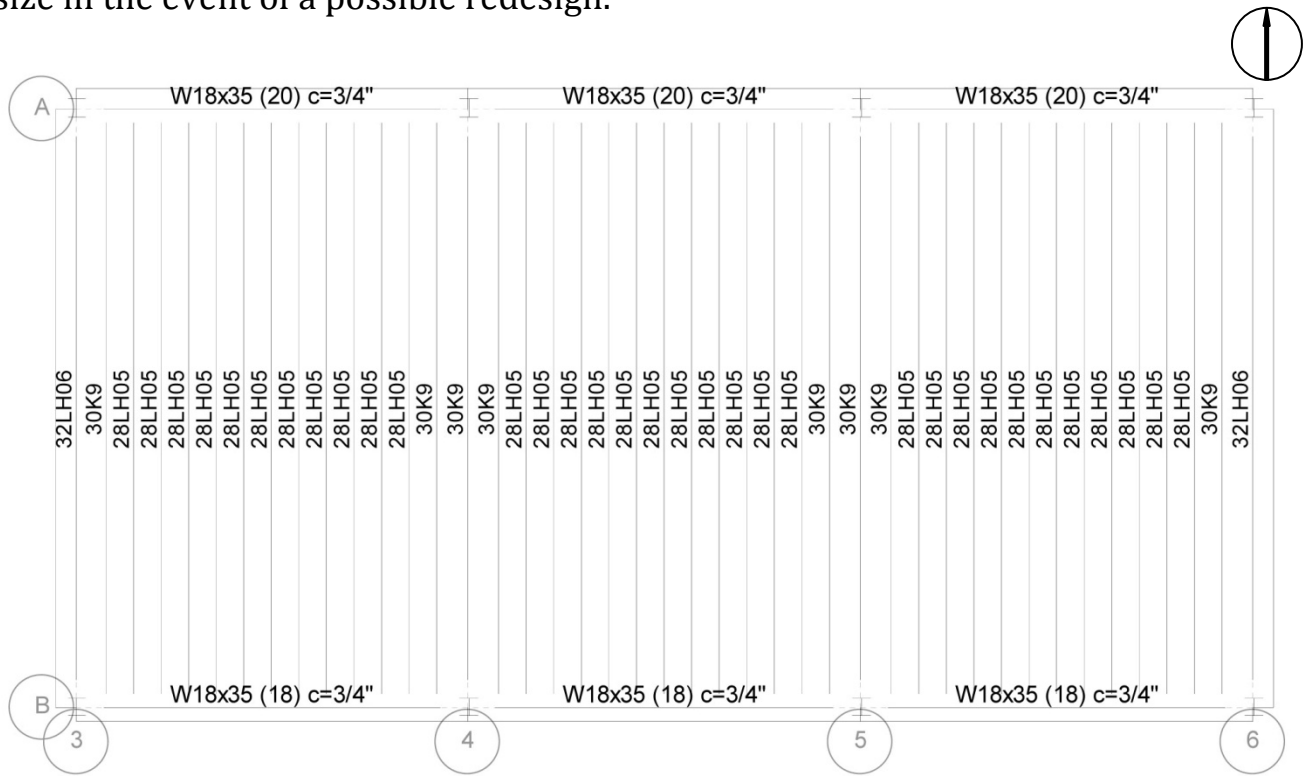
RAM design for open web steel joists with composite deck on beams.
